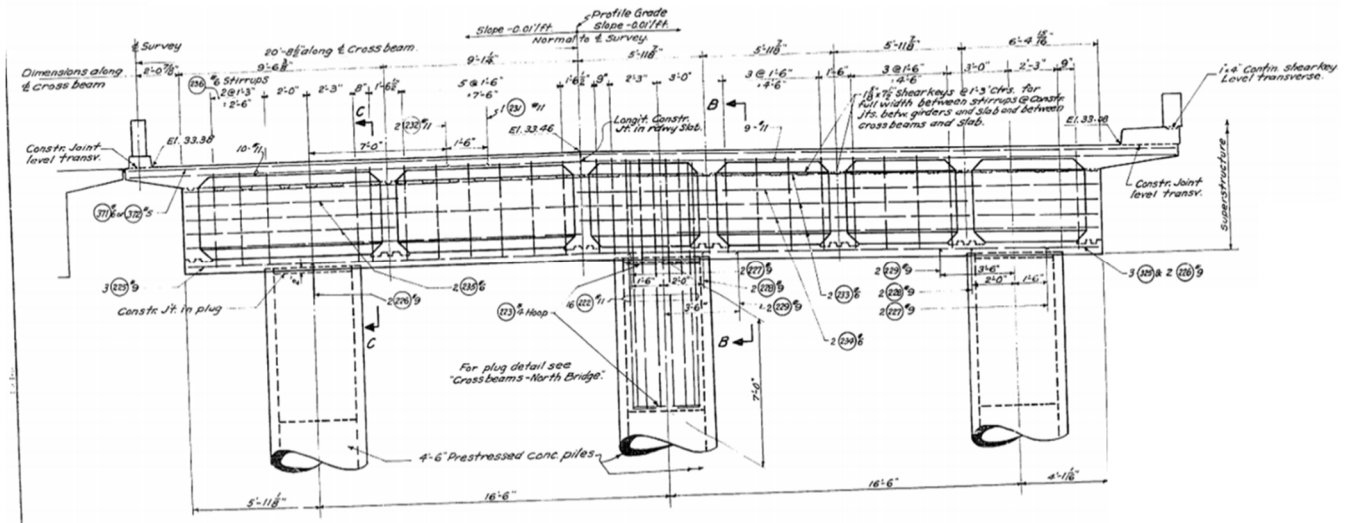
Elevation of Typical Box Girder Cross Beam (Green River)
